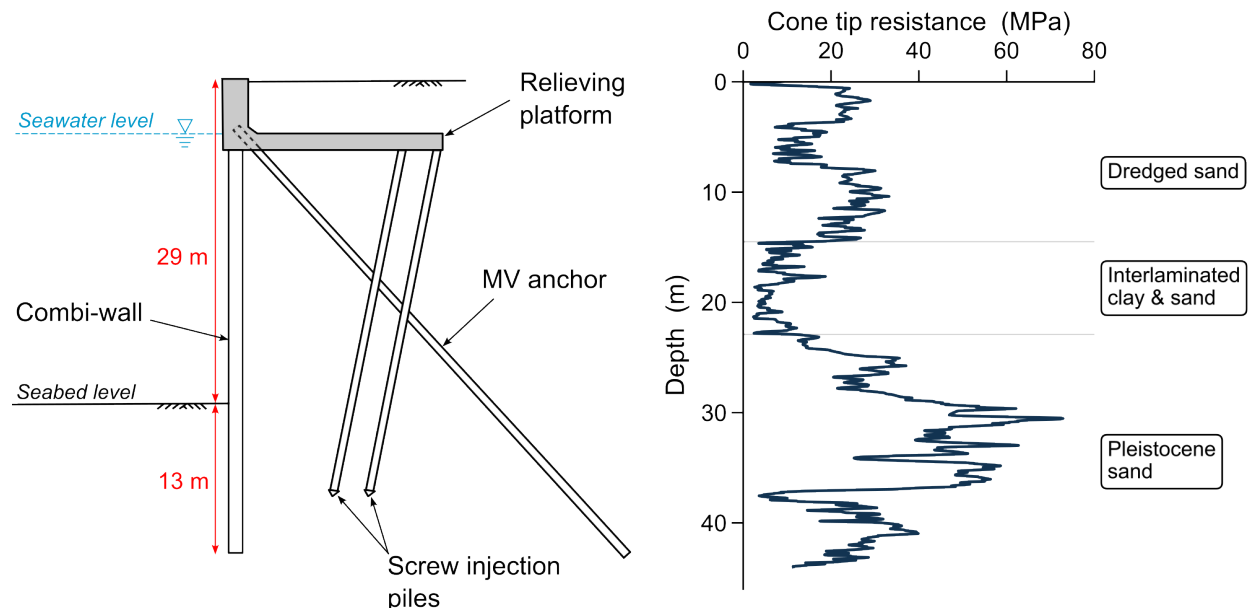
Cross-section of a quay wall and a CPT profile from the site
